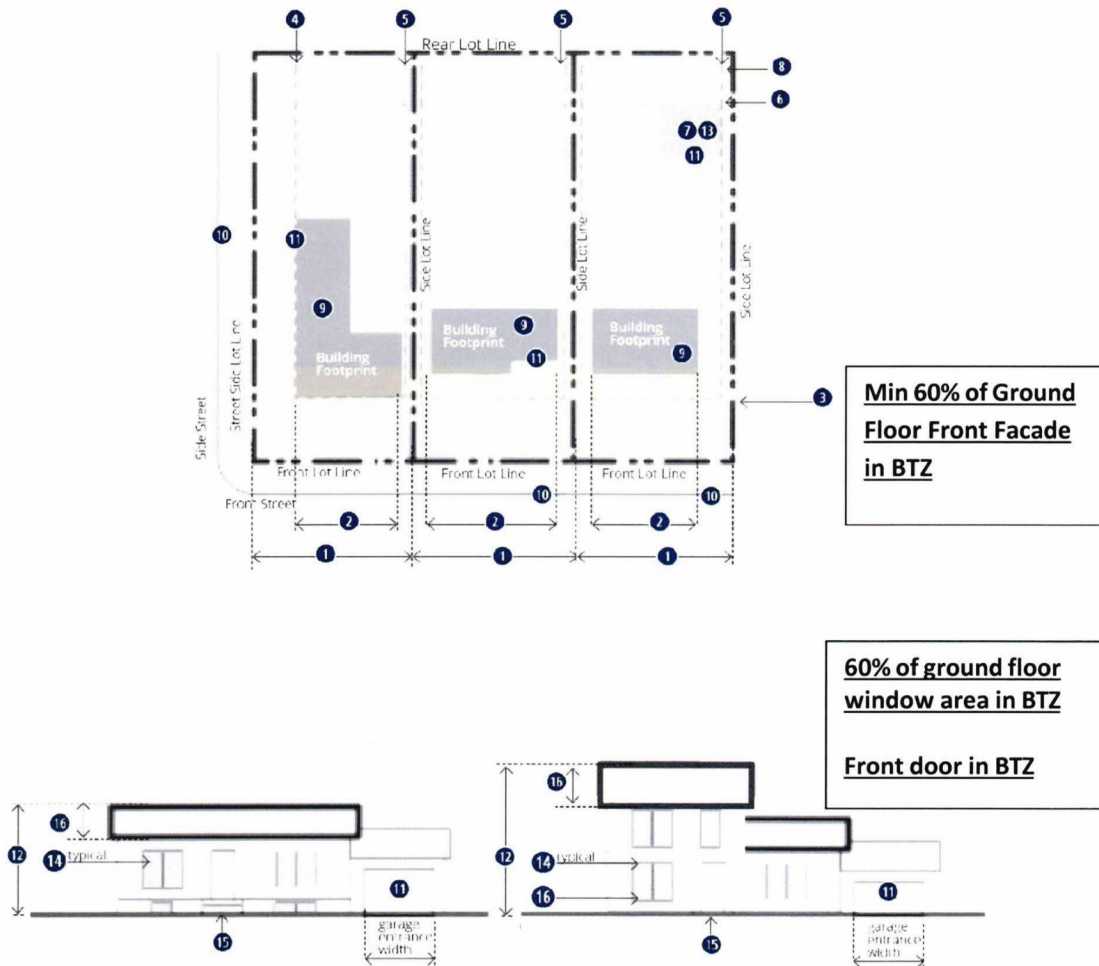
(2). N2 district diagrammatic plans and elevations.
